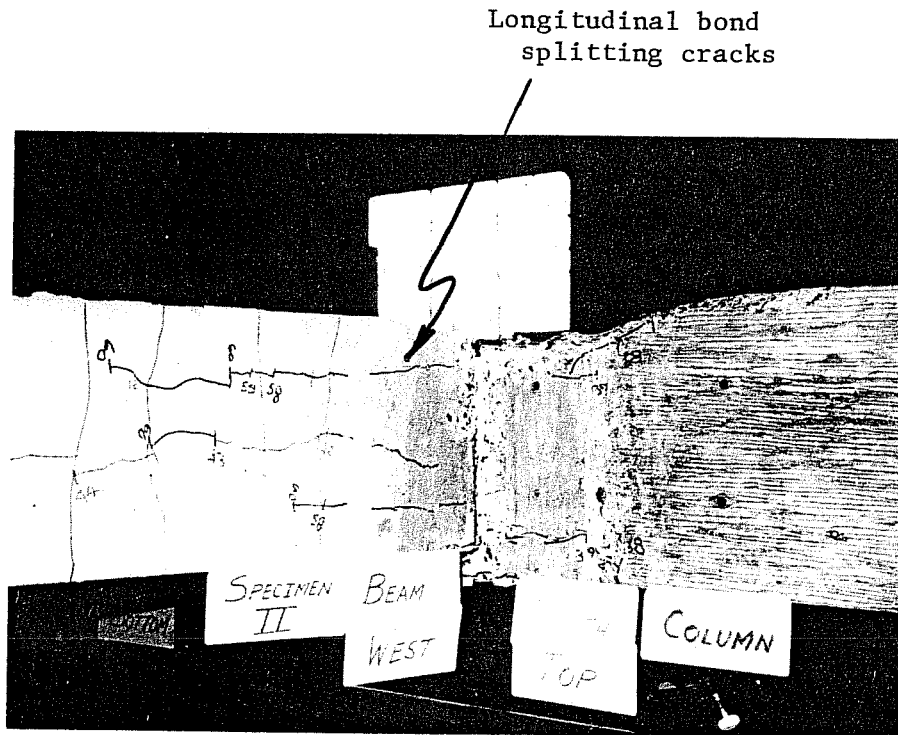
Longitudinal bond splitting cracks above embedded deformed bars (Specimen II)
